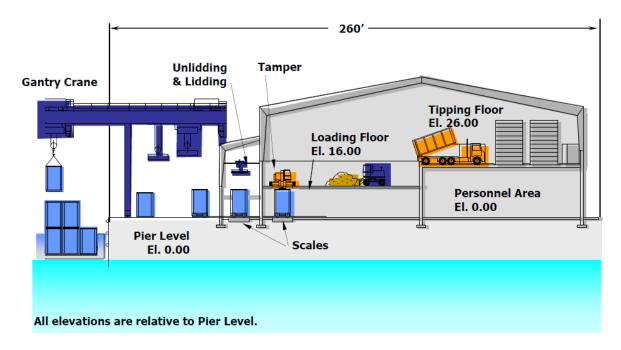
Cross-sectional schematic of the proposed North Shore MTS.
